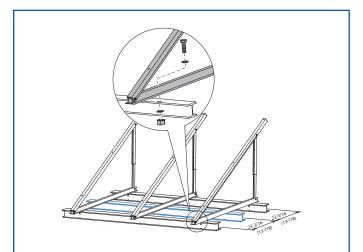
Flat roof support fixed on site with base anchoring to a substructure consisting of I-beam supports (dimensions in inches); value in brackets for landscape version; center contact surface (blue) only required for buildings above 65 ft in height.
